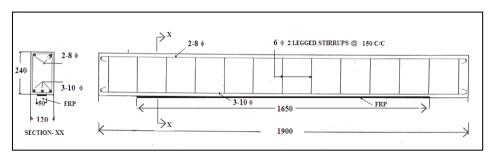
TYPICAL GEOMETRY, REINFORCEMENT DETAILS AND FRP CONFIGURATION OF BEAMS (Group B-Config. 1)
